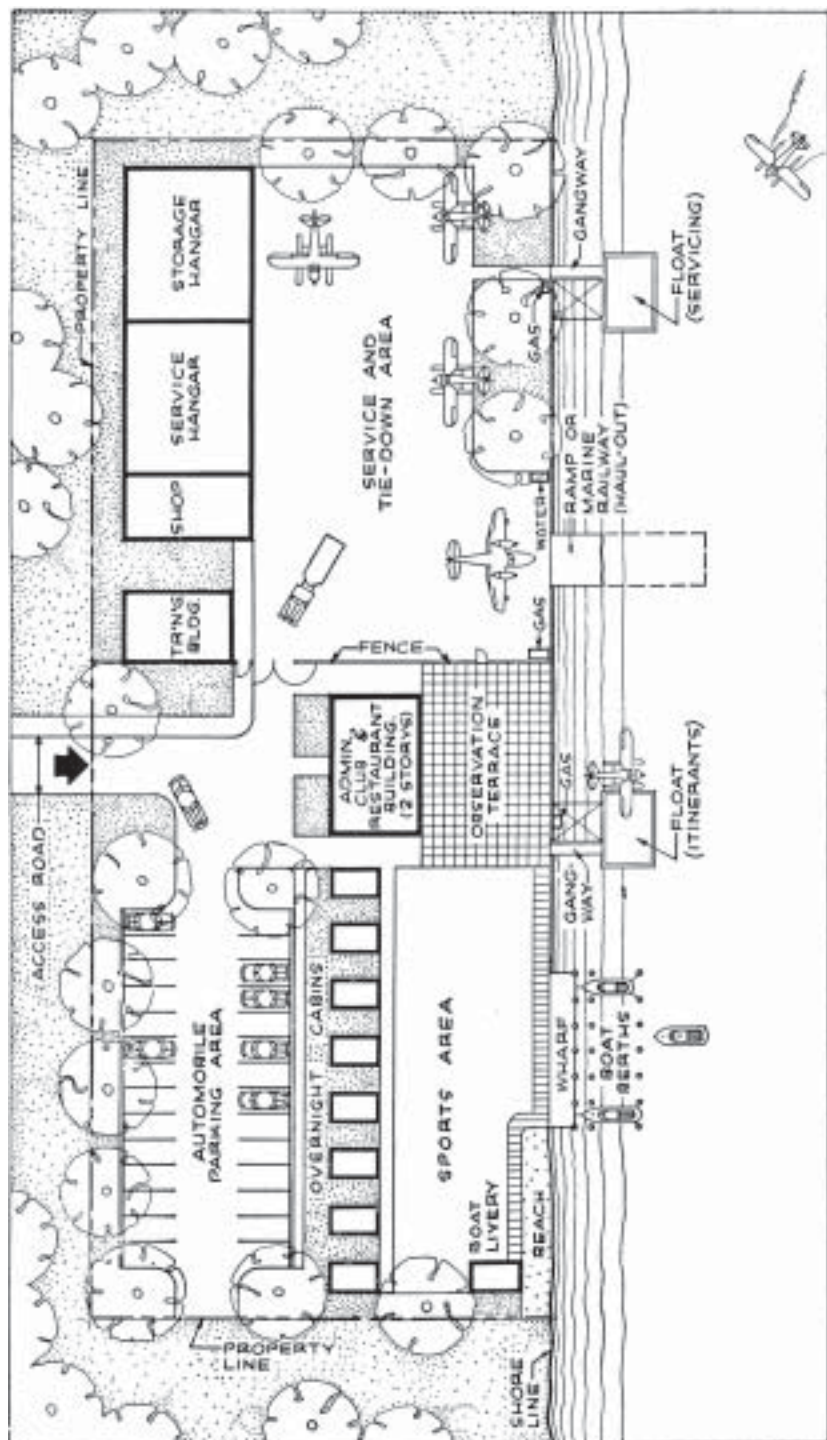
Typical Layout of On-Shore and Shore-Line Development
